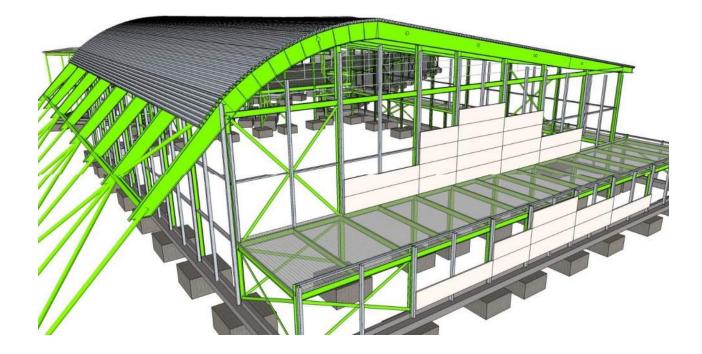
Suggested layout for Kinspan KS100 system with vertical secondary steelwork
